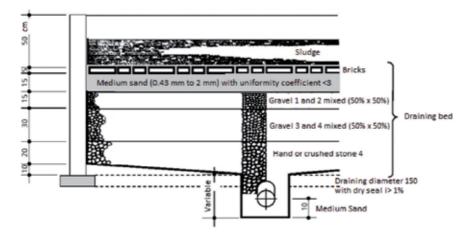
Schematic cut of a sludge drying bed (source: the author).
